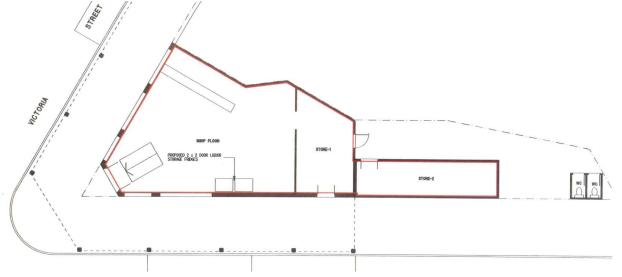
Proposed Redline Plan as provided by the Permit Applicant.
